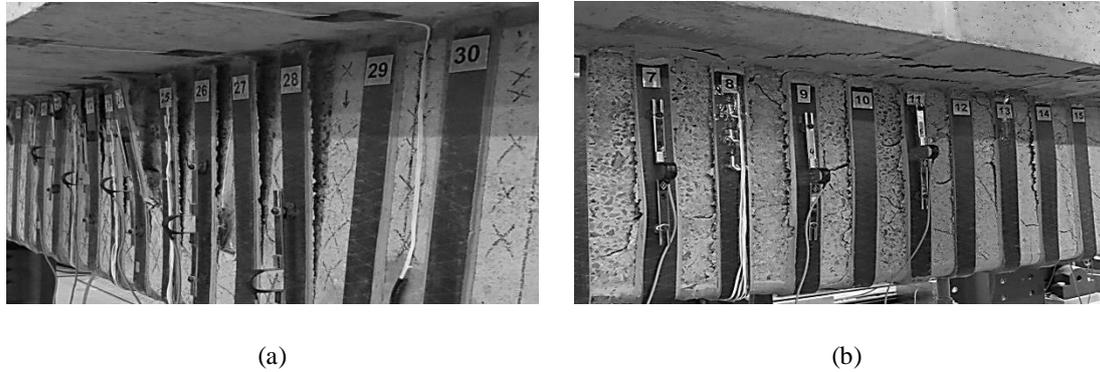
Shear failure: (a) CFRP laminate debonding in L.S1.Str; and (b) CFRP laminate debonding in L.S1.Str-Anc without anchorage pullout.
